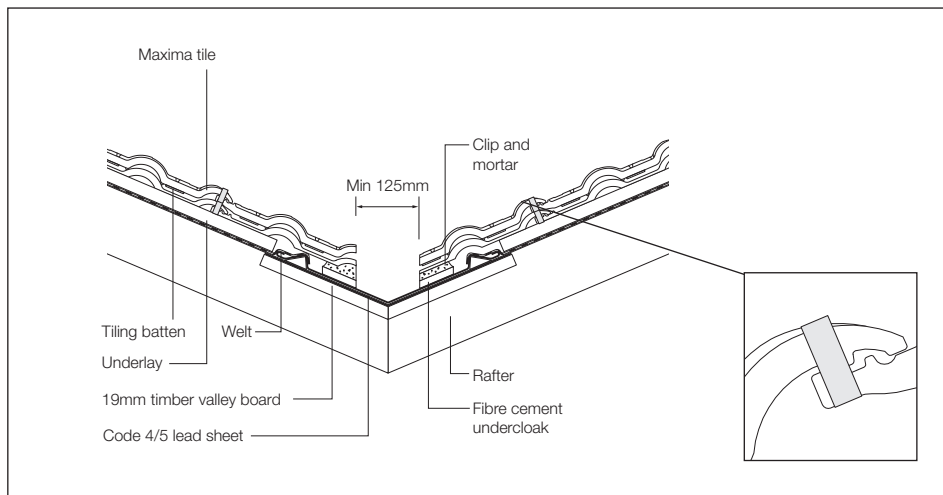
Section through bedded, metal lined valley (inset shows fixing clip for small cut pieces)
